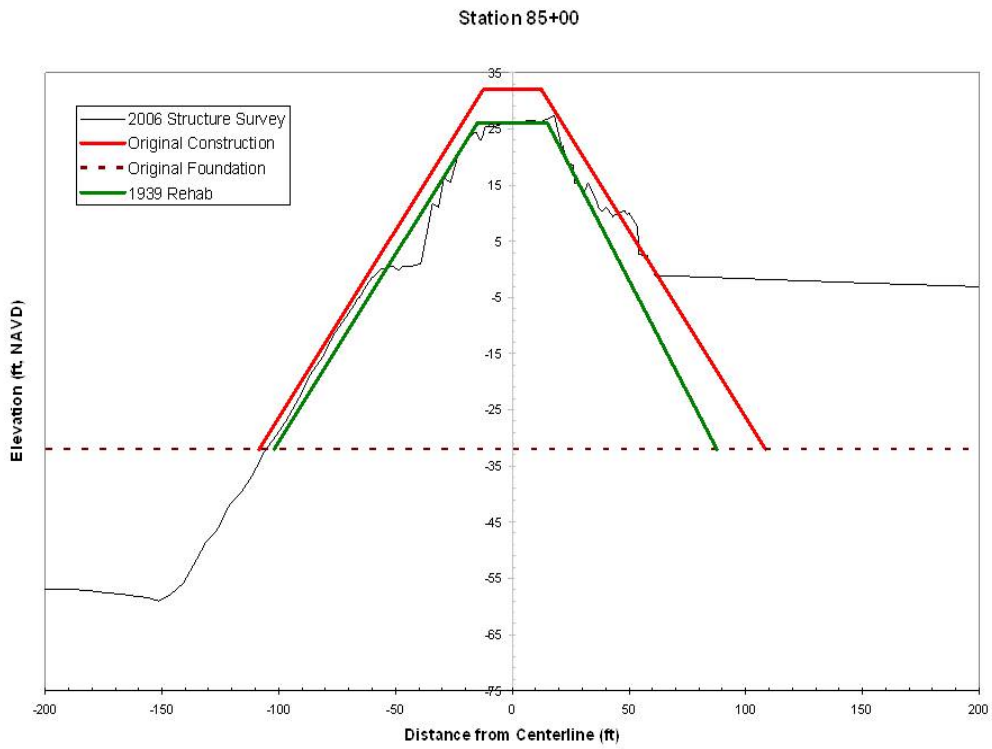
110. North Jetty Cross Section Templates - Trunk
